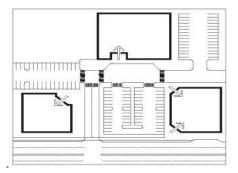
(A): Example showing how shared driveways and consolidated parking lots can
